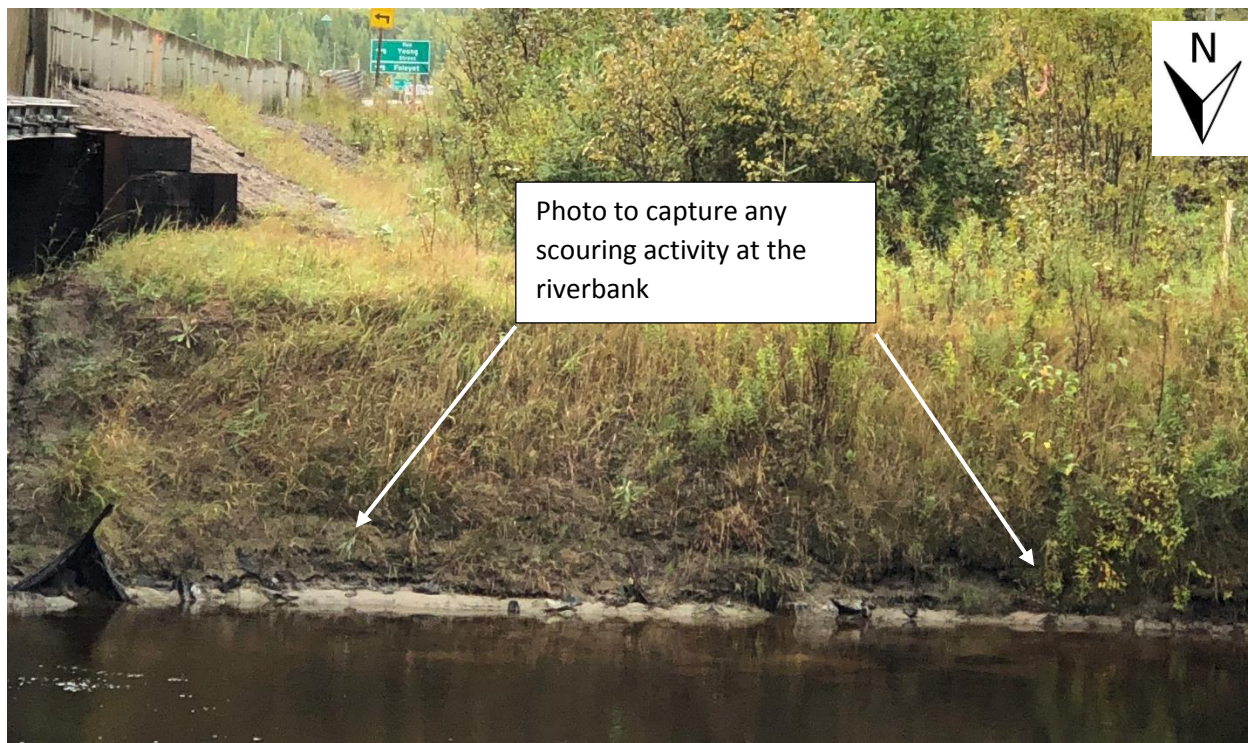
Looking towards South at the river bank for erosion activity at the south abutment along the proposed bridge alignment (September 2018)
